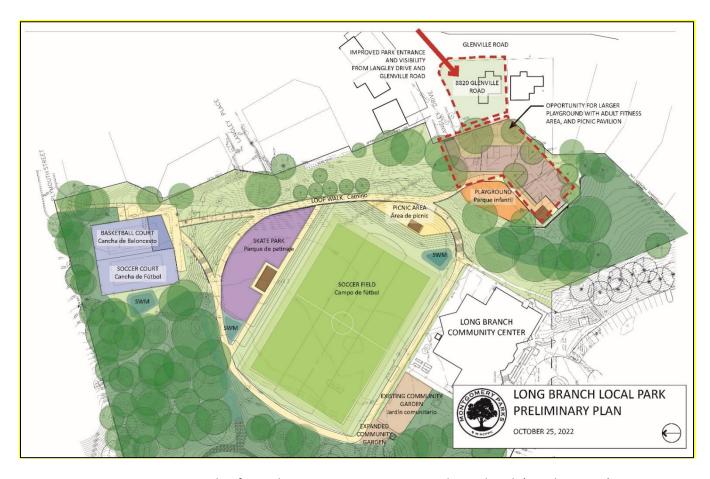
Concept Plan for Park Improvements, Long Branch Local Park (October 2022)
